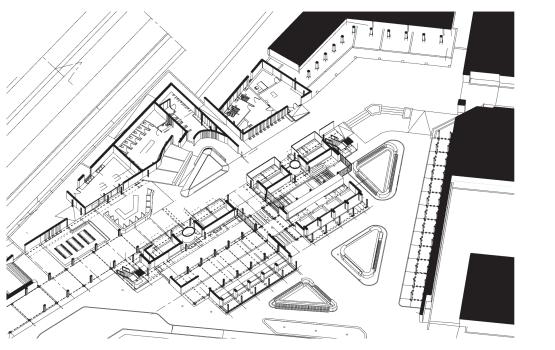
Plan Axo of the ground floor (Nemasetoni 2021)
